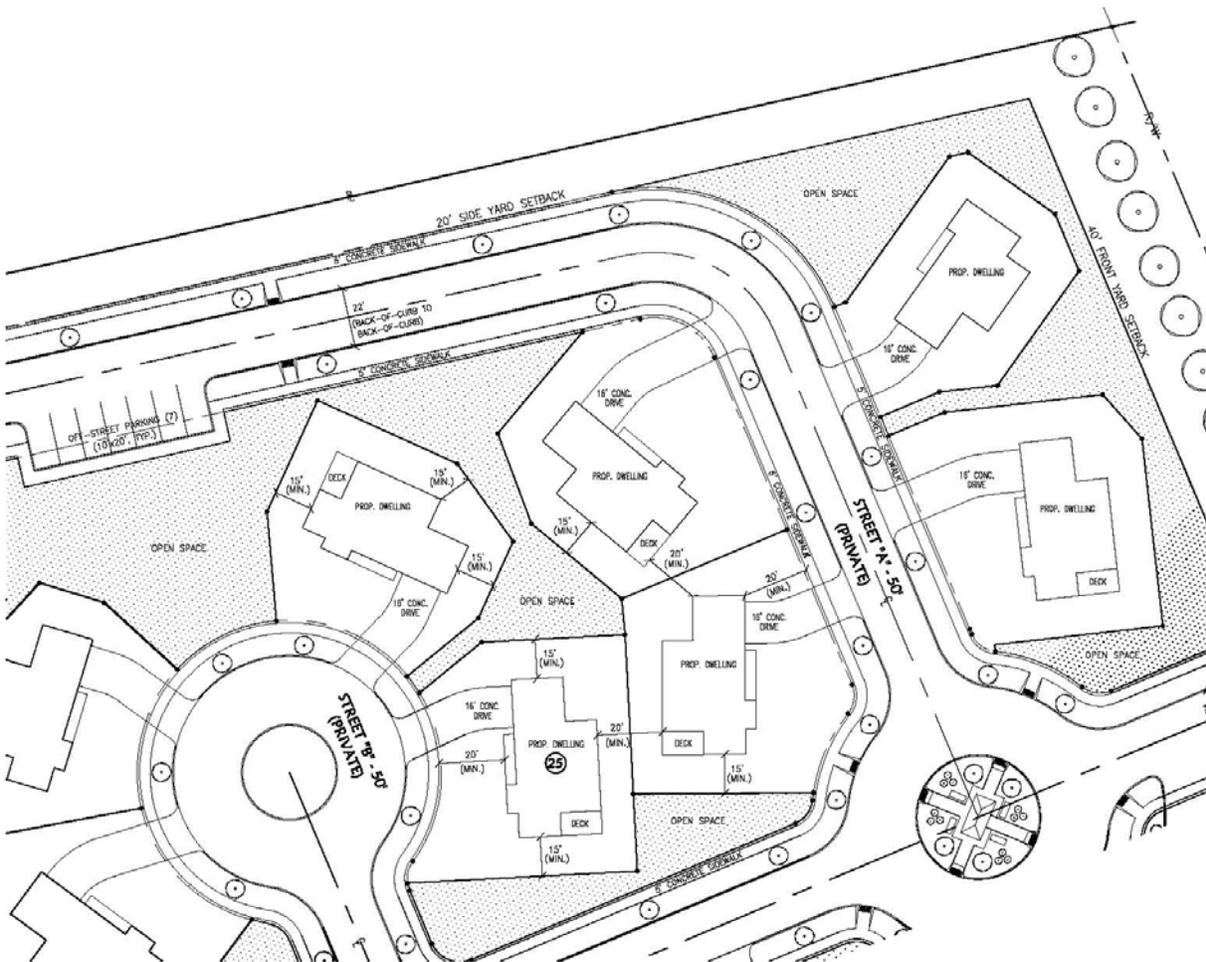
TYPICAL BUILDING SPACING & YARD REGULATIONS
